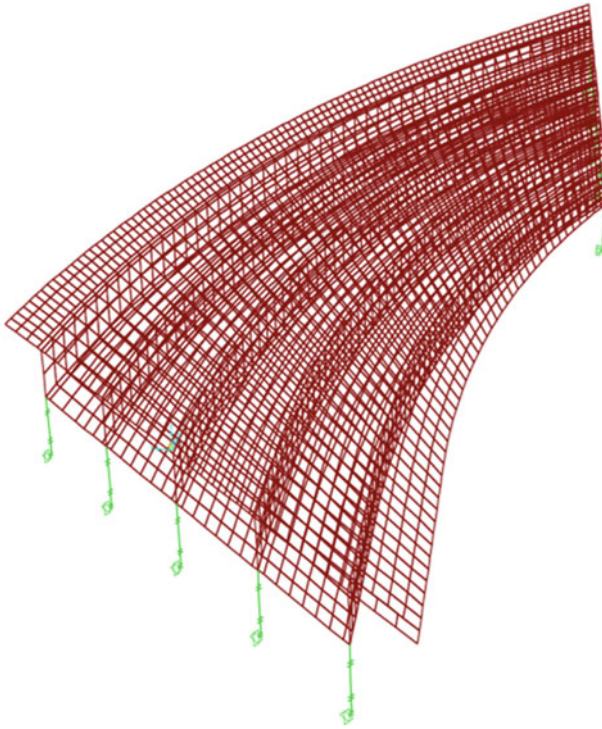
3D finite element model of a typical skew-curved bridge (curving towards right) showing all discrete elements along the span length
